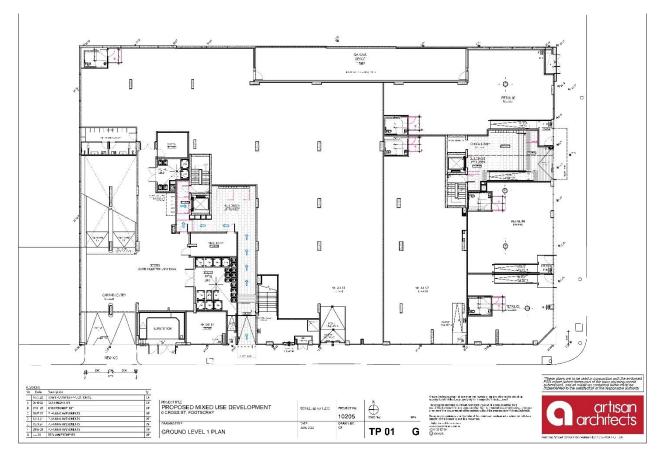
Parking Layout: Ground Level (plan No. TP 01 G by artisan architects)
